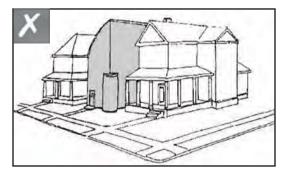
Example of inappropriate massing and form of new infill building, which contradicts the existing form and vocabulary of adjacent historical buildings
